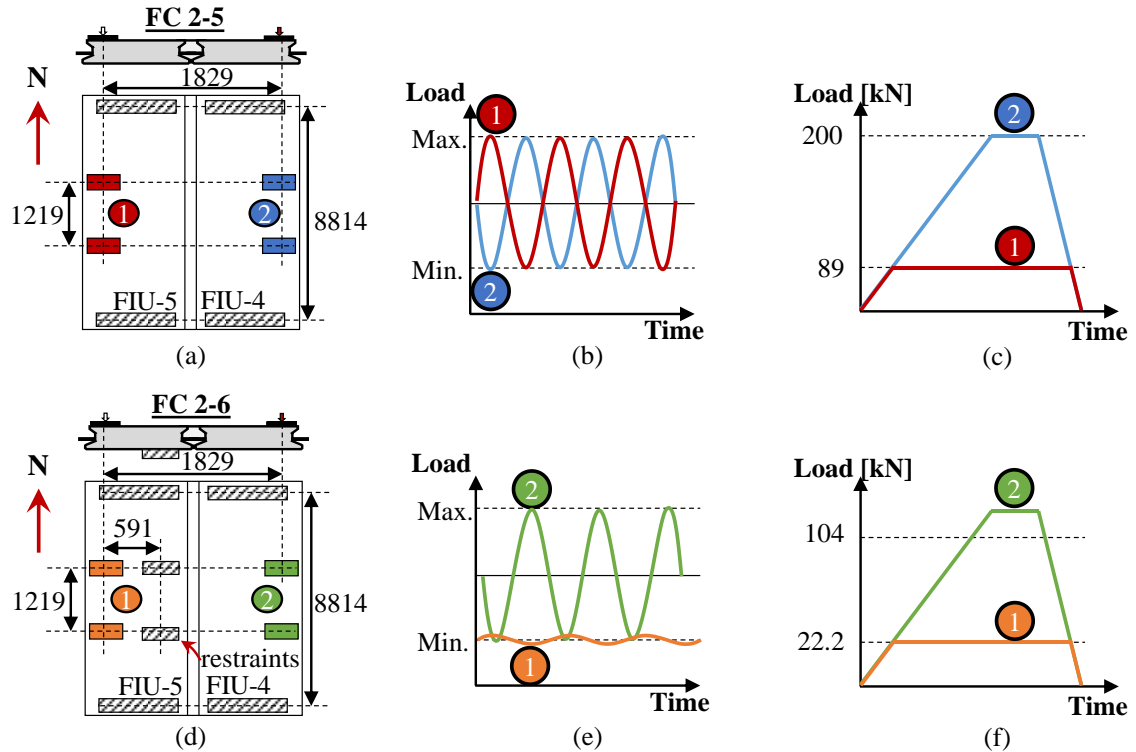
Test setup for configurations: (a) FC 2-5 plan/elevation views, (b) reverse sinusoidal load protocol for FC 2-5, (c) static transverse cracking load protocol for FC 2-5cr, (d) FC 2-6 plan/elevation views, (e) reverse sinusoidal load protocol for FC 2-6, and (f) static load protocol for FC 2-6st. (units: mm, 1 mm = 0.0394 in.)
